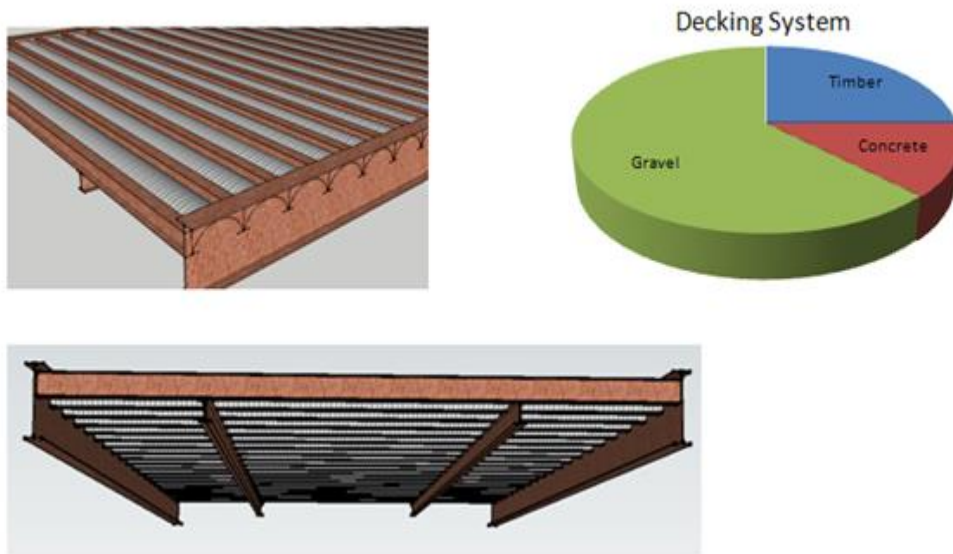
Two-girder Bridge Type 5, 8 Bridges, 2.5%
